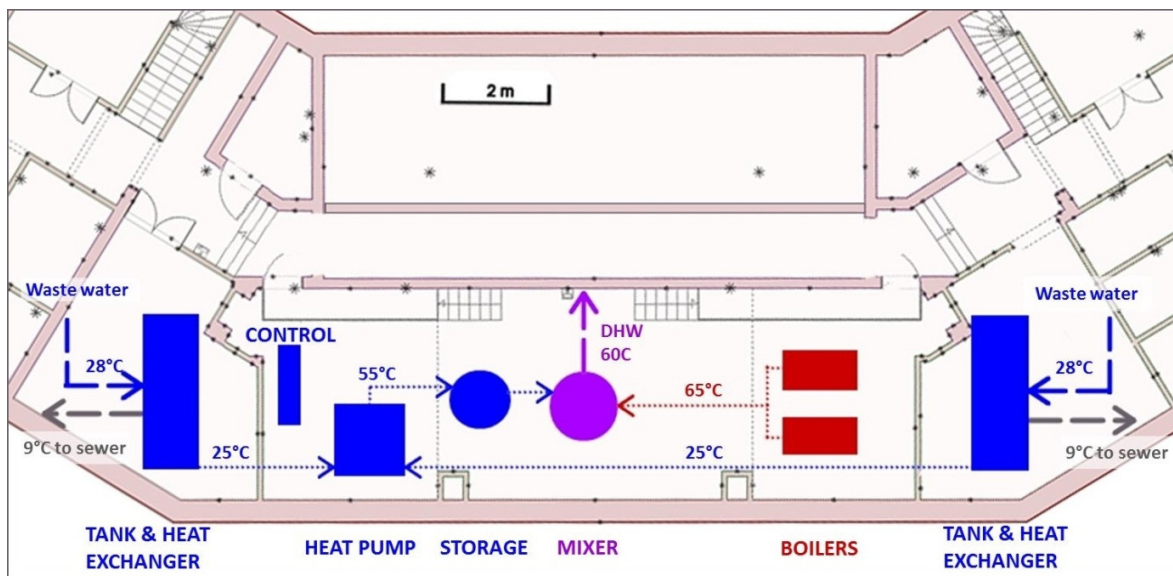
Location in building: Sketch of Biofluides system installation in the basement.
